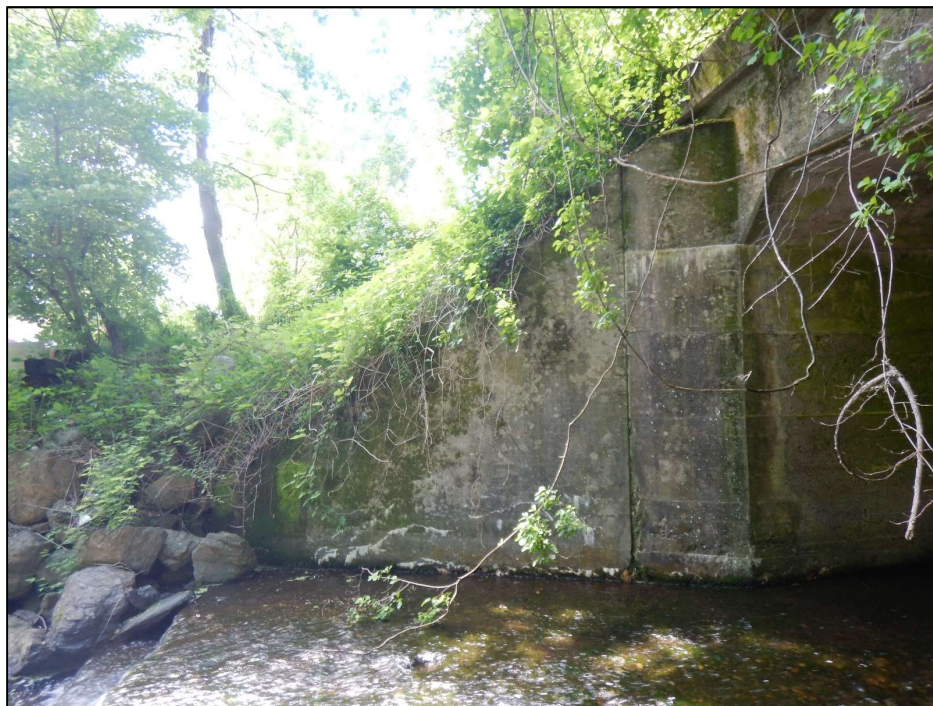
General view of the southeast wingwall at the outlet looking south. Note the heavy vegetation overgrowth.
